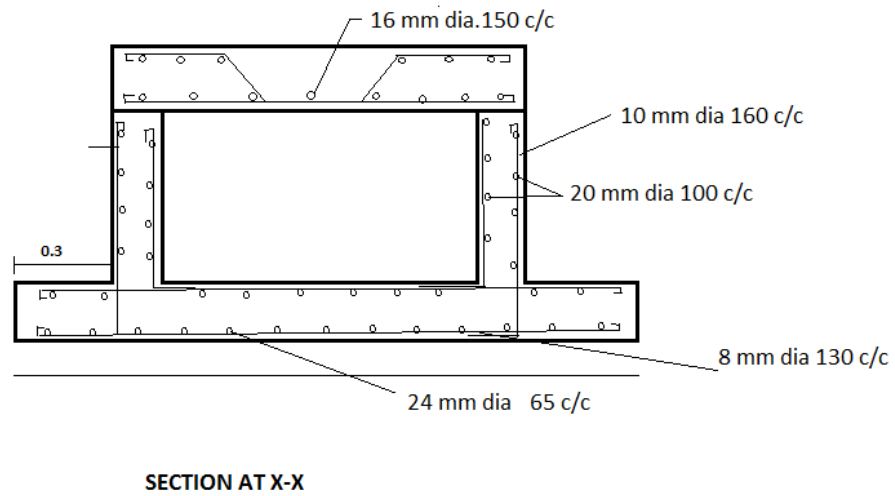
Longitudinal Section of Sump For Civil Engineering Department
